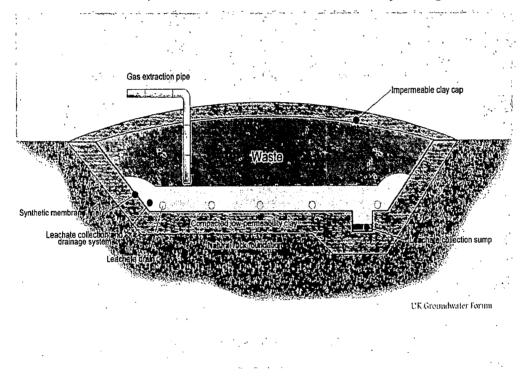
Cross section of landfill (source: www. groundwateruk.org, 2007)
